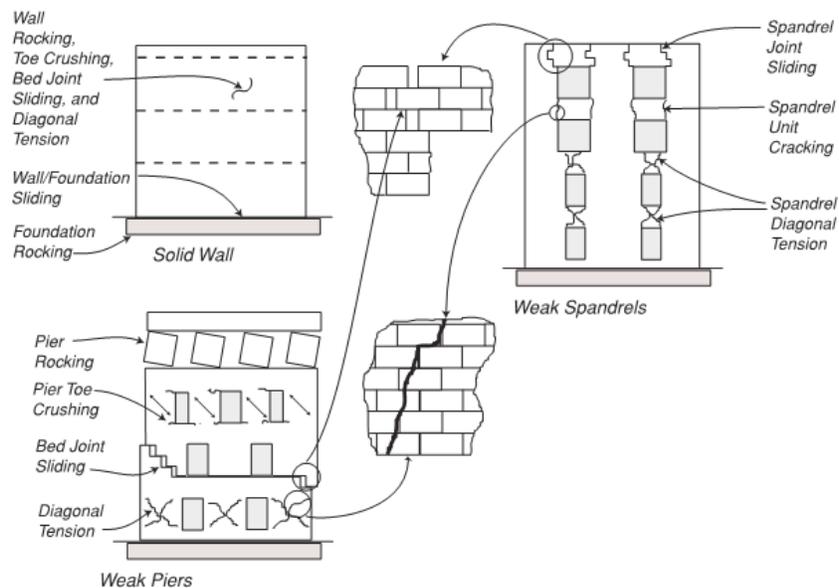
In-plane failure modes of URM wall (FEMA 2000)
